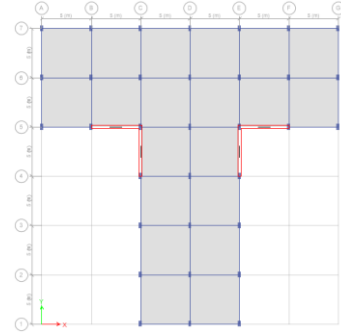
Plan of T shaped Building with shear wall having vertical opening
